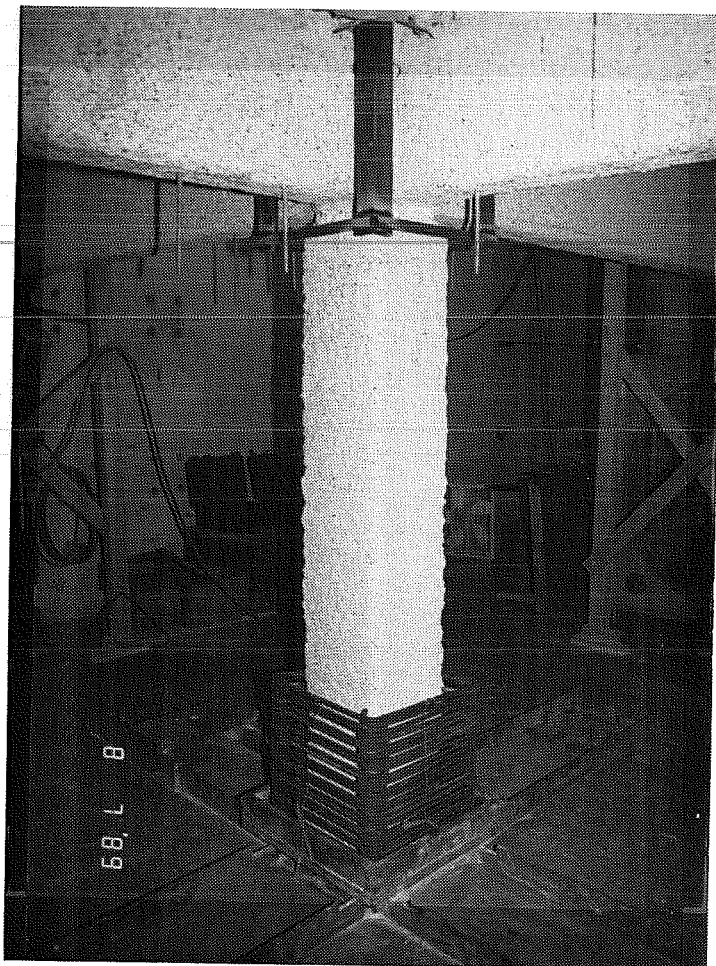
Jacketed Specimens - Column Transverse Steel
